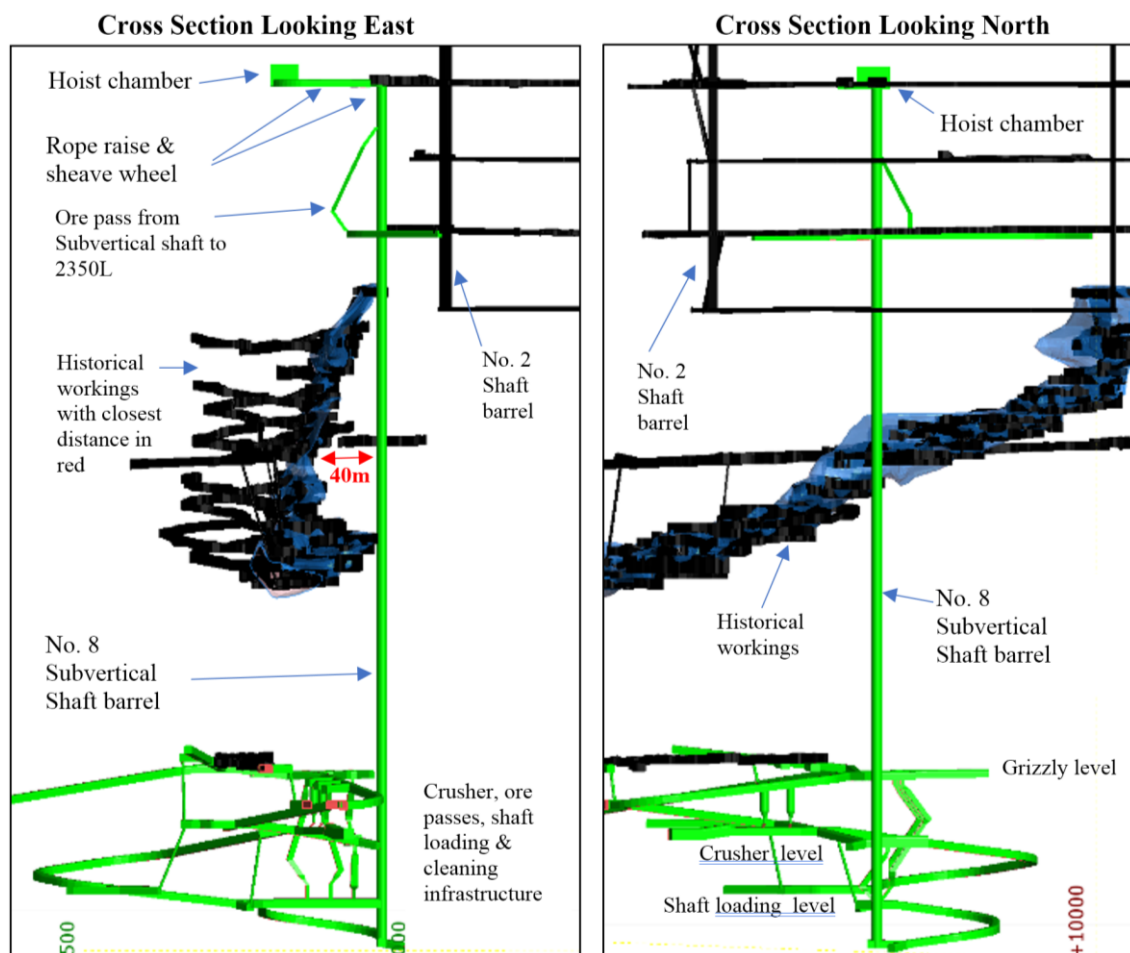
Cross sections east and north of the No. 8 subvertical shaft
